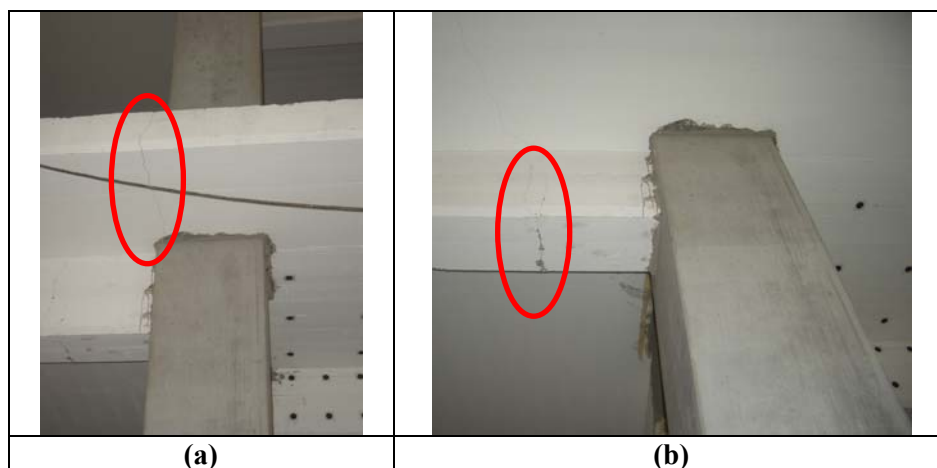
Cracks on the slab (a) and beam (b) in proximity of column C3 at 1st storey.
